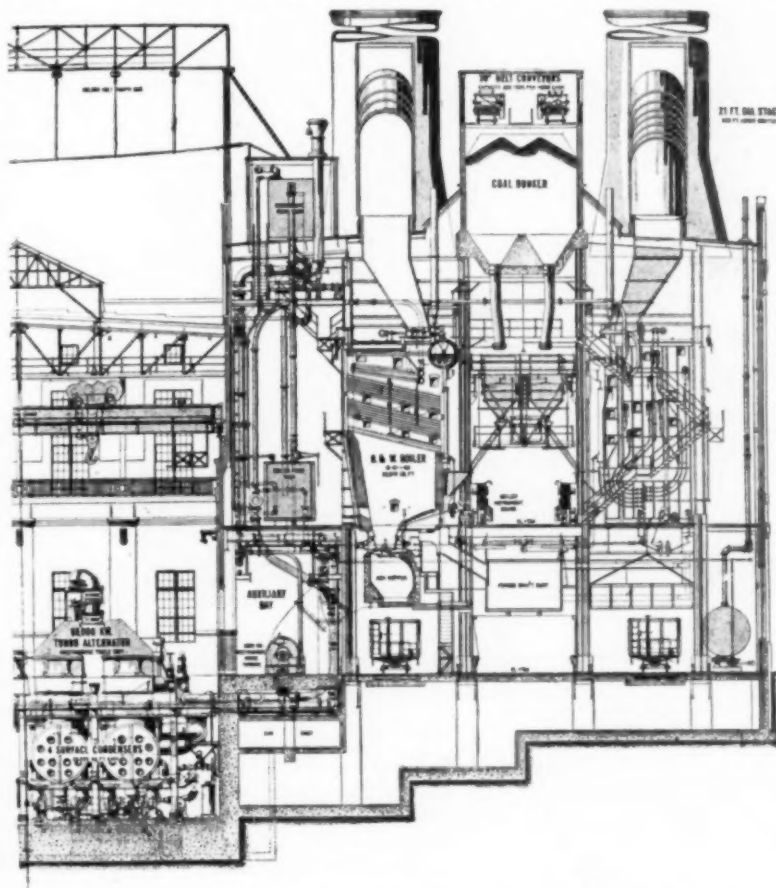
CROSS-SECTION OF BOILER HOUSE AND PART OF TURBINE ROOM
